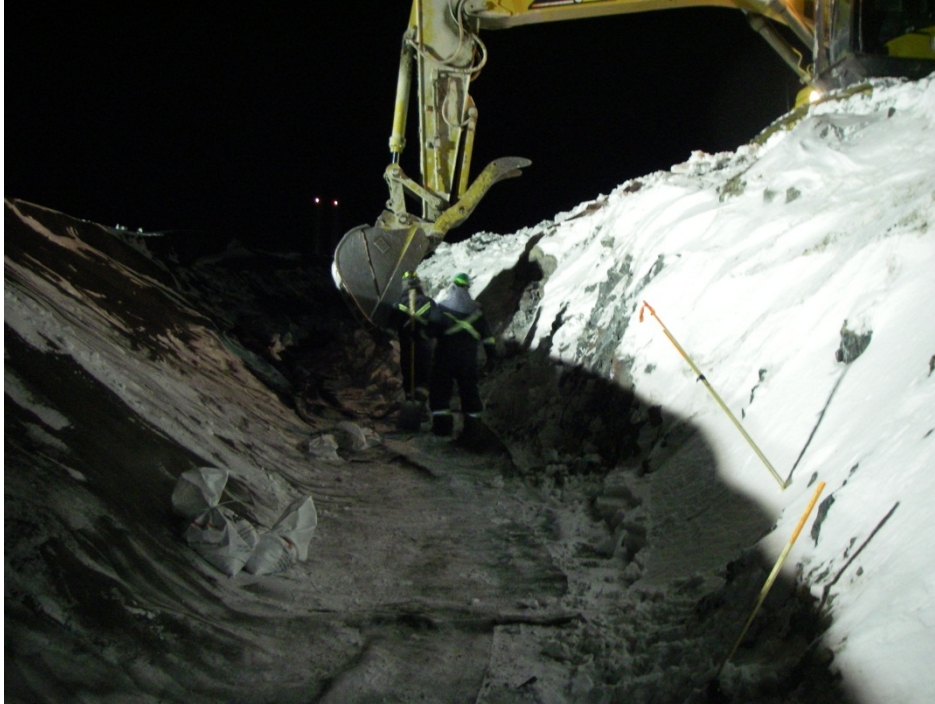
Diversion Berm – workers clearing the snow drifts from the keytrench with support from an excavator. Photo looking west from Sta. 0+520.
